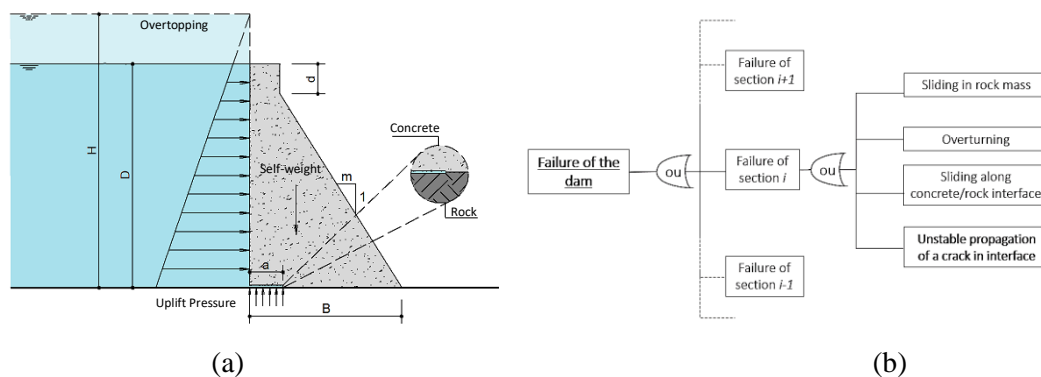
Typical concrete dam configuration with overtopping: (a) typical cross section (b) system of failure modes
